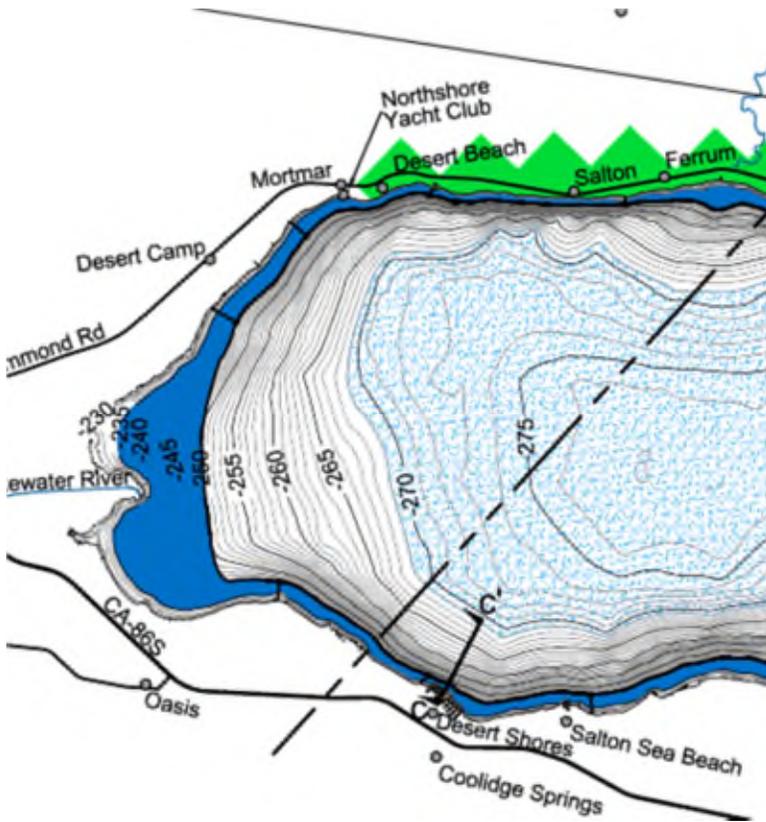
North End Levee in 15 ft Water- Perimeter Lake Plan
